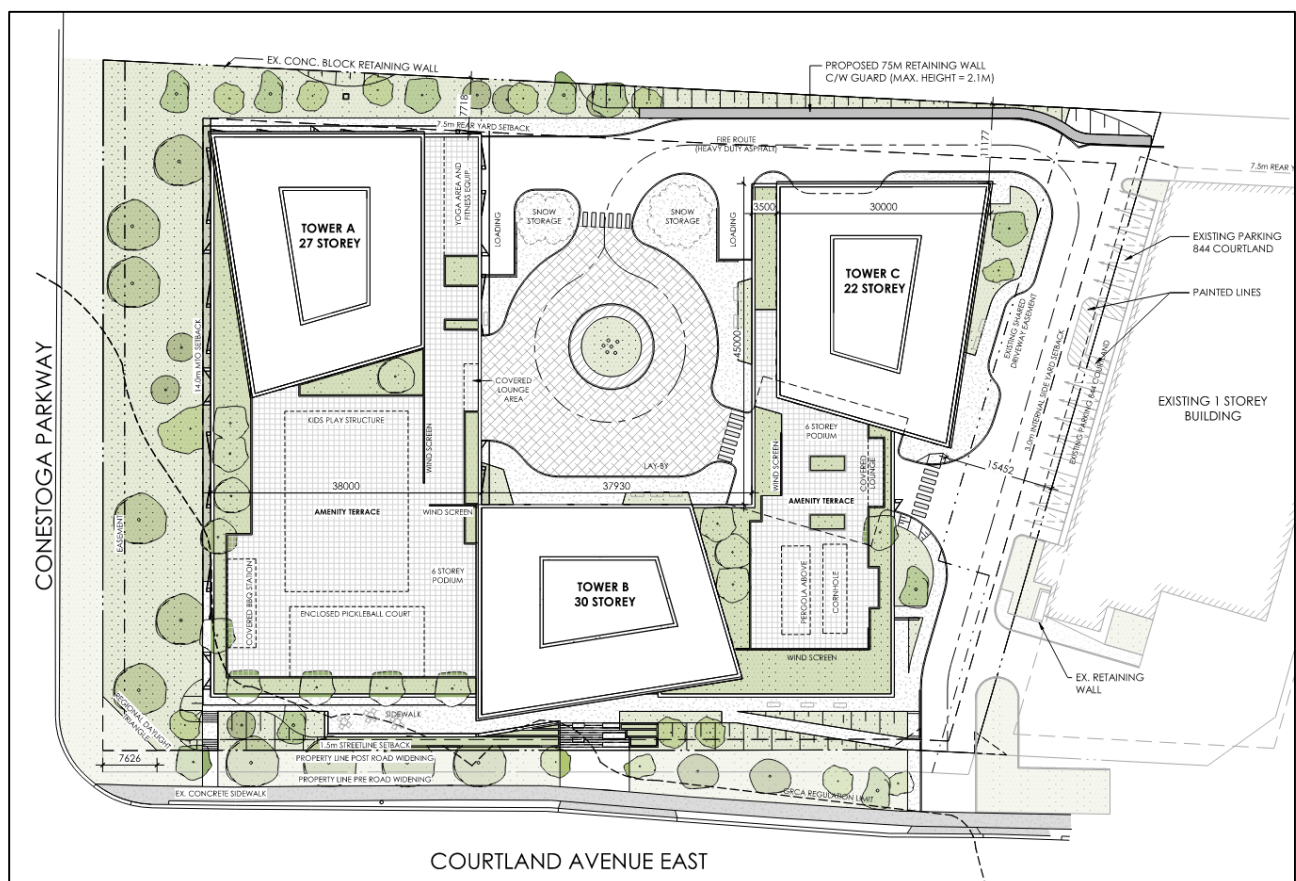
Aerial Site Plan showing the Proposed Development Concept
